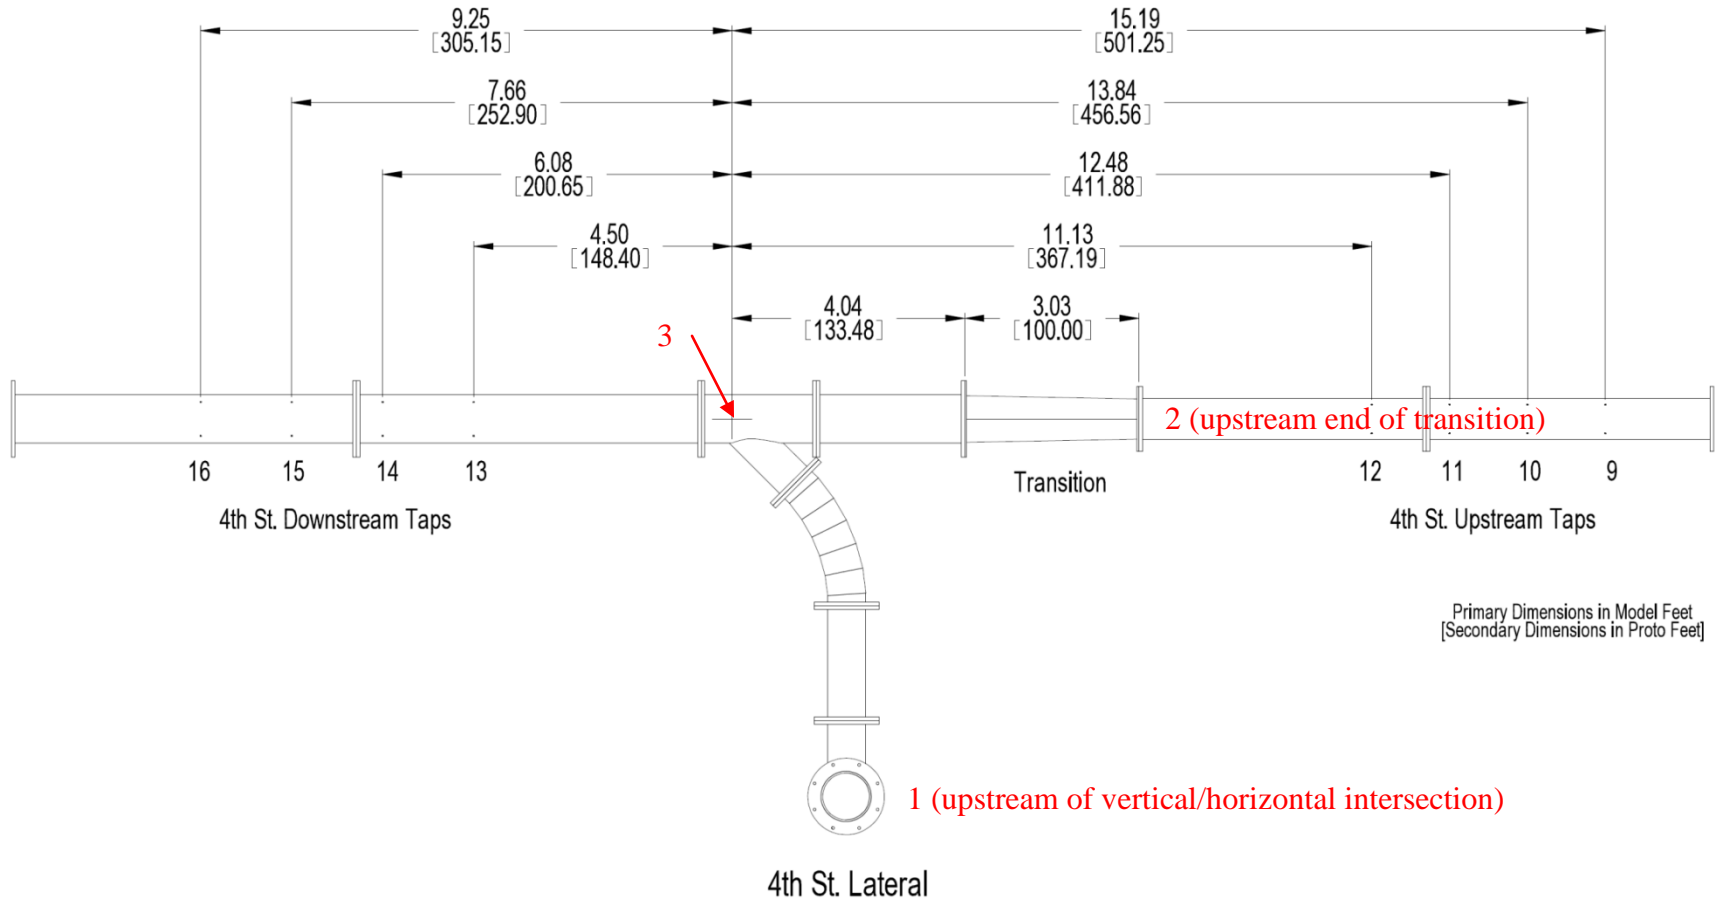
Waller Creek Tunnel Project; 1:33 Scale Model-4th Street Lateral Tap Locations
